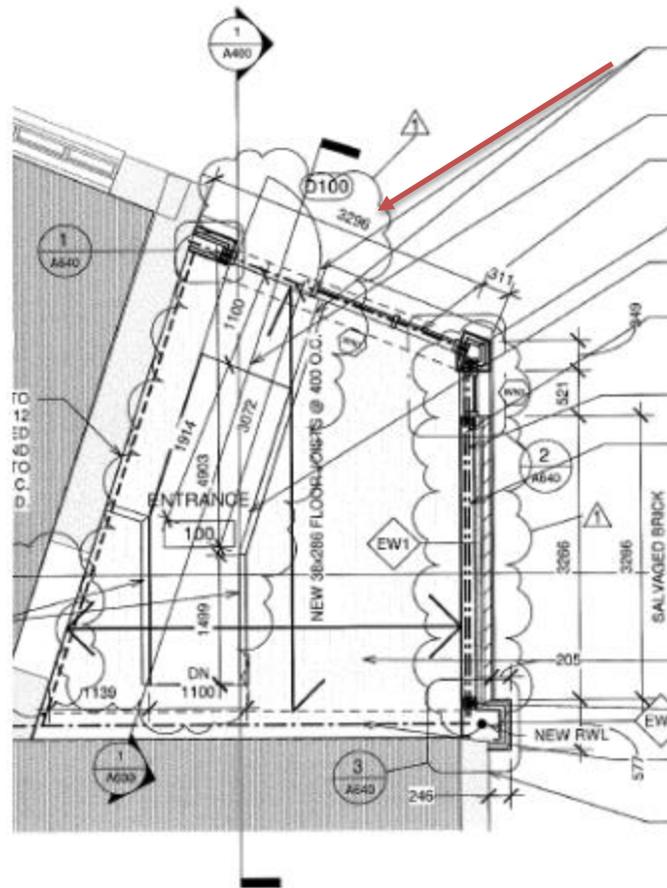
Excerpt for Drawing A200 Ground Floor Plan at new addition
